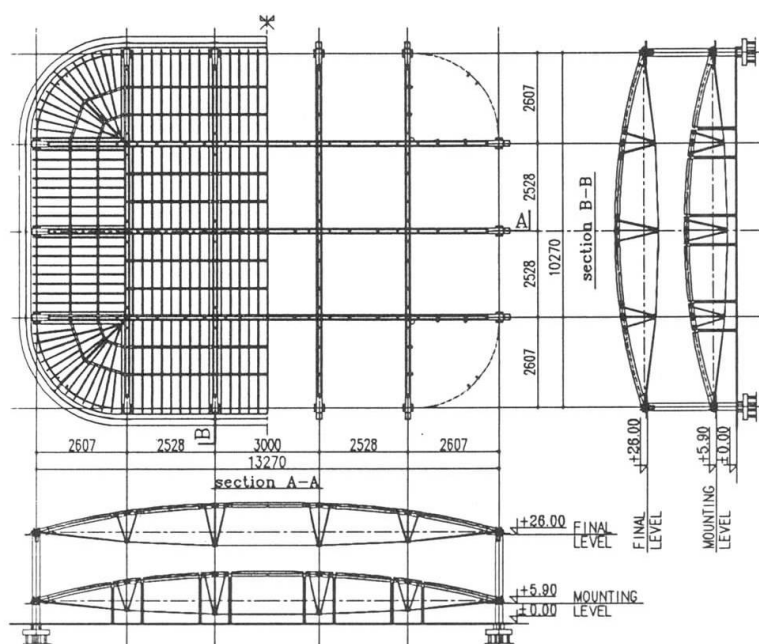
The roof structure with main roof girders on mounting level on temporary scaffolds and on final level, on the tops of the main columns
